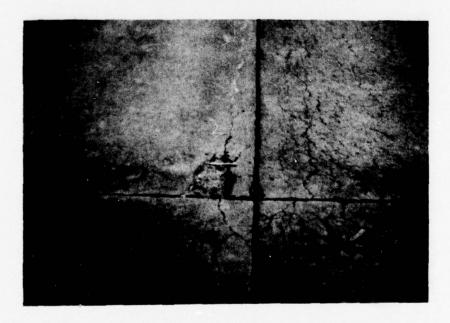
Surface Cracking near Intersection of Longitudinal and Transverse Joints, Stapleton Airport.
